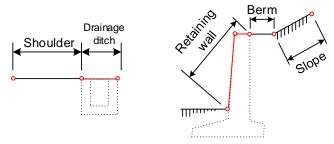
How to create "Surface" of a structure (left: drainage ditch, right: retaining wall)
